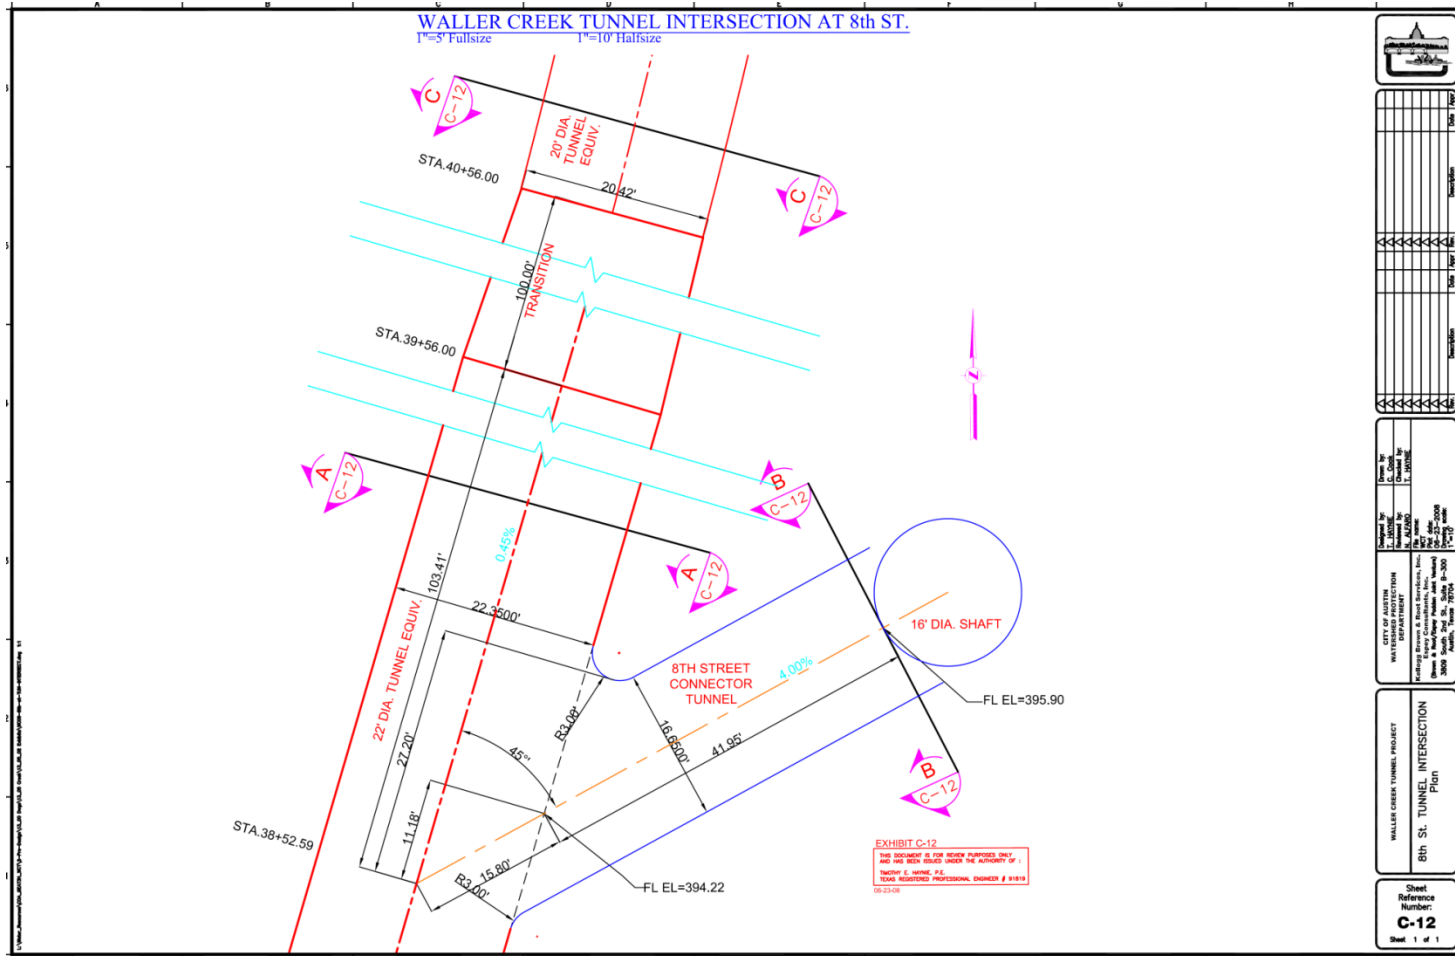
Waller Creek Tunnel Project; Tunnel Intersection at 8th Street-Plan
